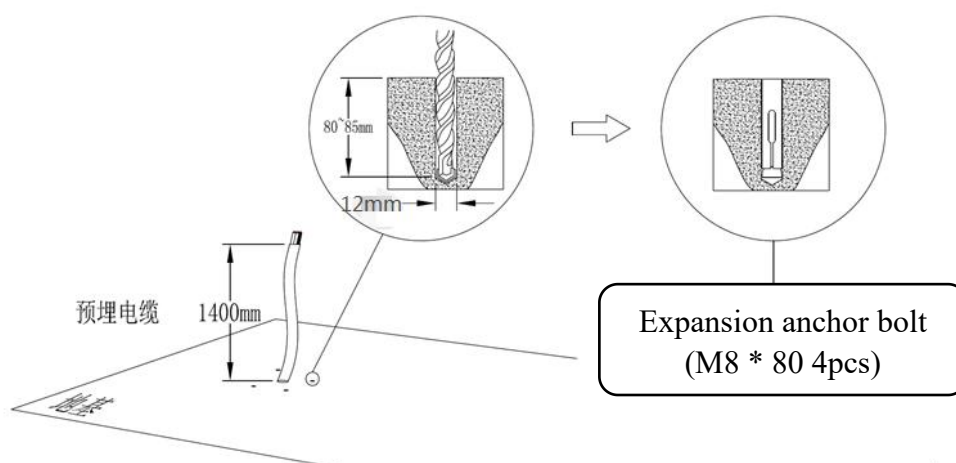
Embedded Expansion Anchor Bolt
